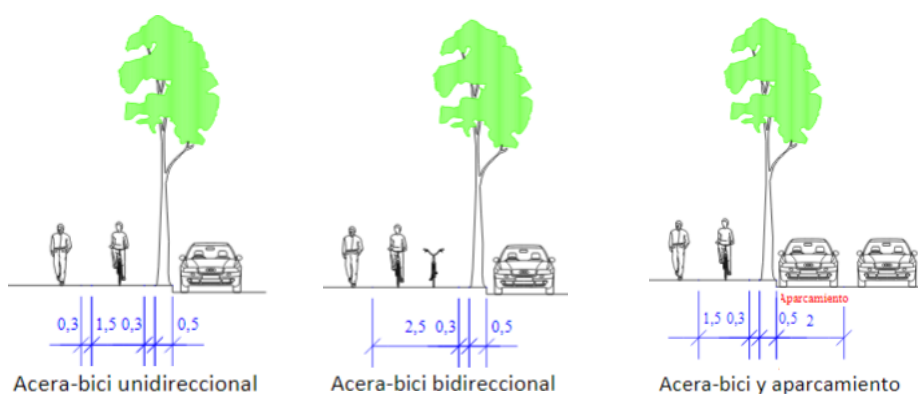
Segregated cycle-sidewalk section (Source: revision PGOU 2017).
